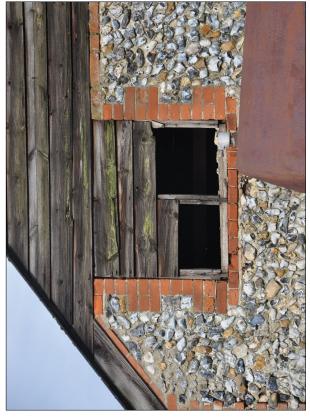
Detail of window to east facing elevation of Room 1 in Building D
